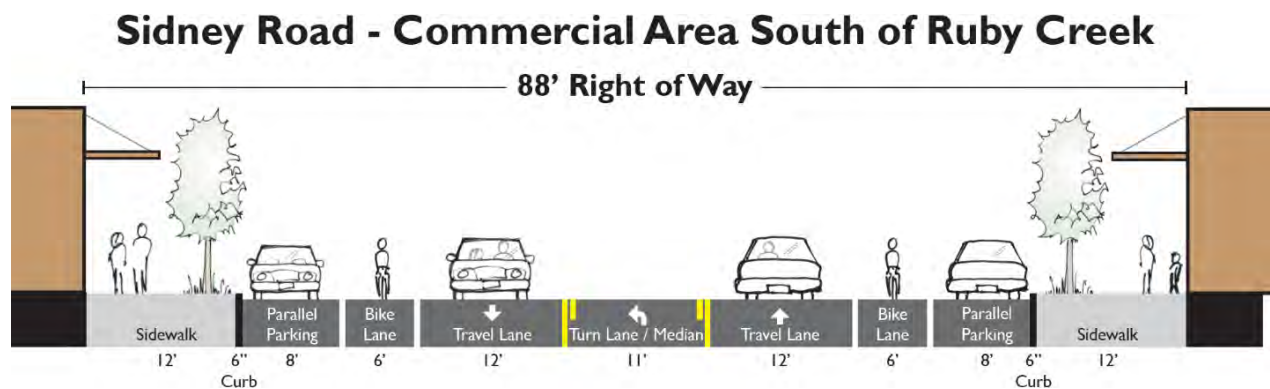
Sidney Road SW – Storefront Road Section. This road section corresponds with the section of Sidney Road SW designated as a storefront street in Figure 13.
